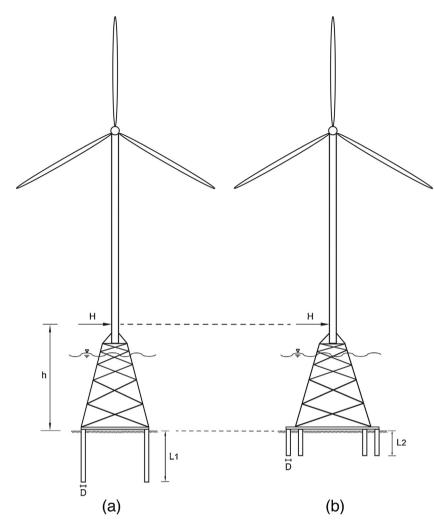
Schematic sketch of OWEC on foundation systems: (a) conventional pile-supported jacket (L1 = 12.5D); (b) jacket with closely spaced double piles (L2 = 6.25D, S = 3D).
